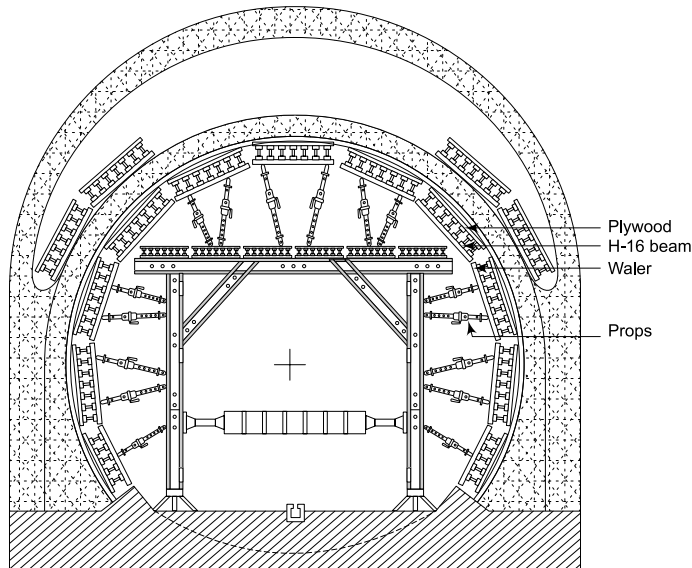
Formwork Arrangement for Tunnel Construction (Courtesy Doka).
